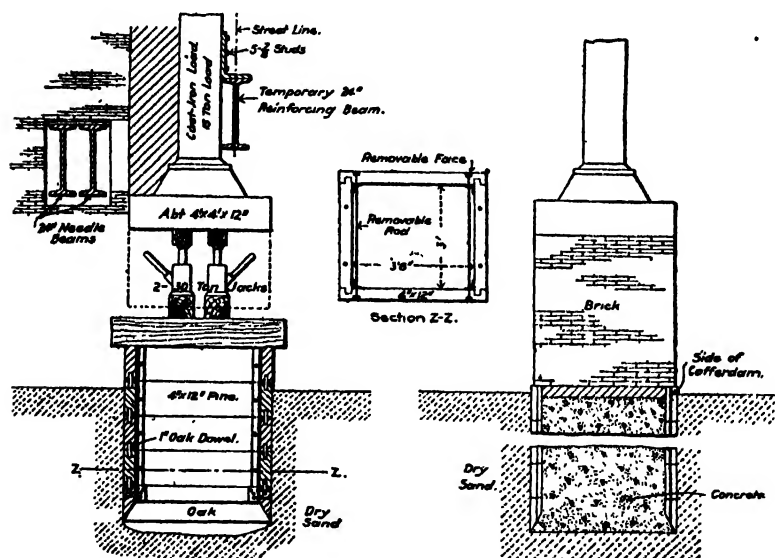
Method of Sinking Open Cribbs for Underpinning, Merchant's and Trader's Bank Building, New York.
